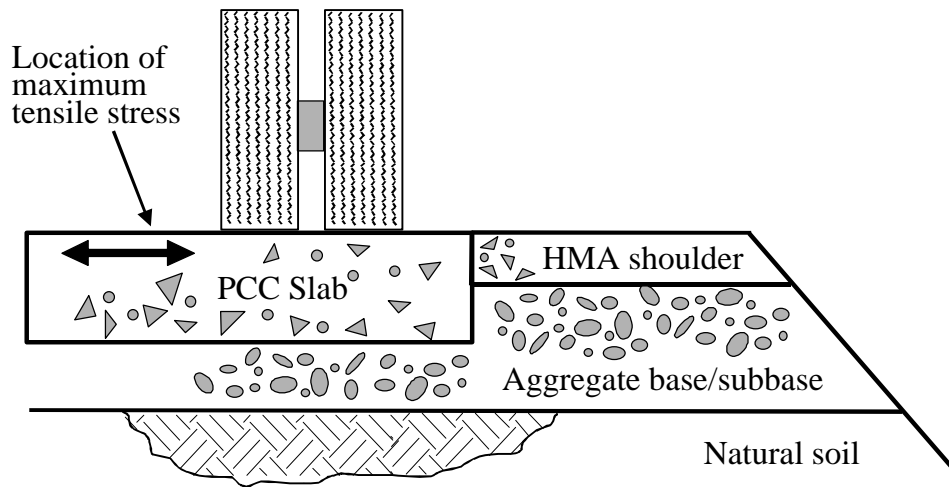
Illustration of the behavior of a typical PCC slab (with flexible shoulder) when loaded near the slab edge.
